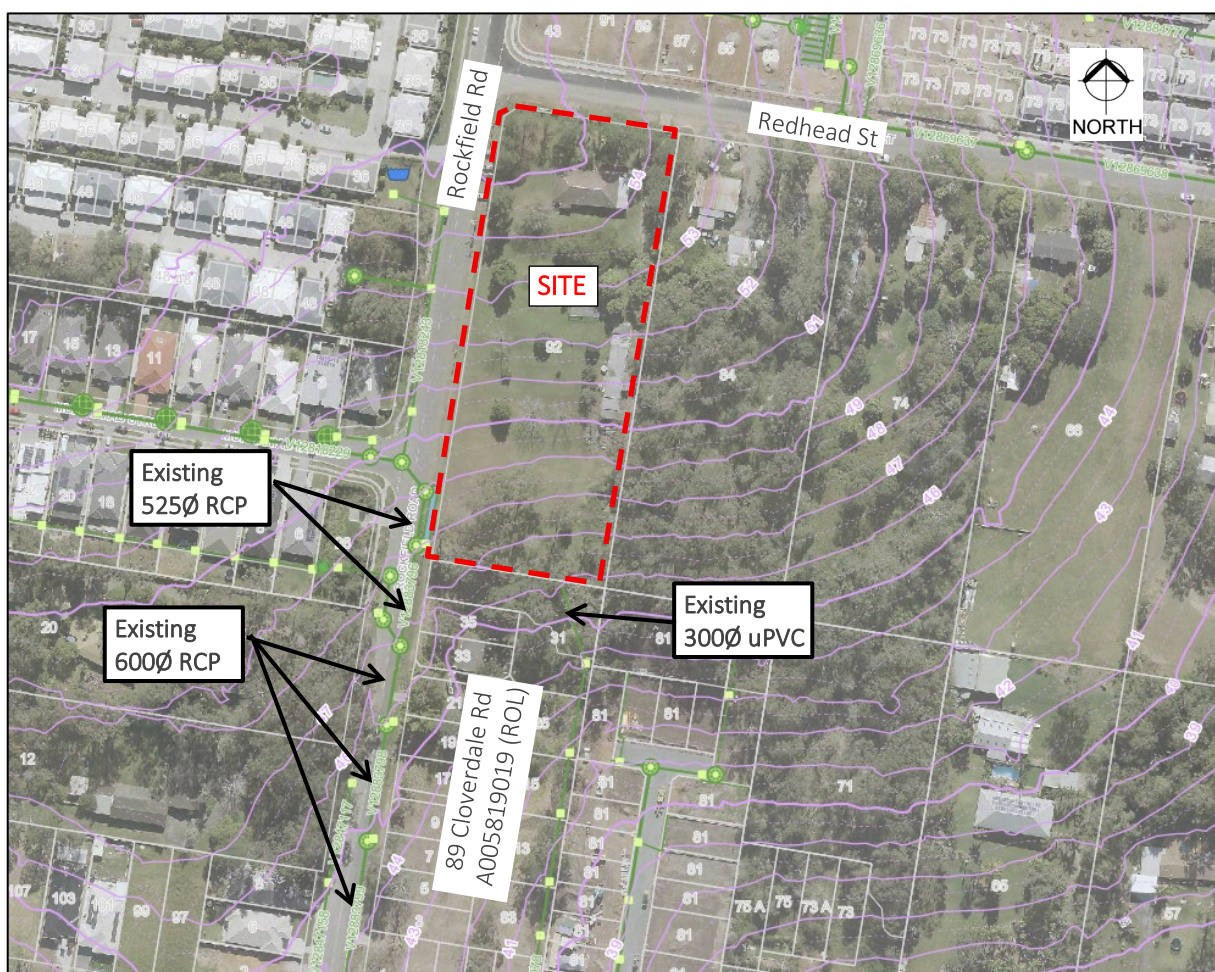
Site Location, existing drainage & aerial imagery (source: BCC Community Maps)
